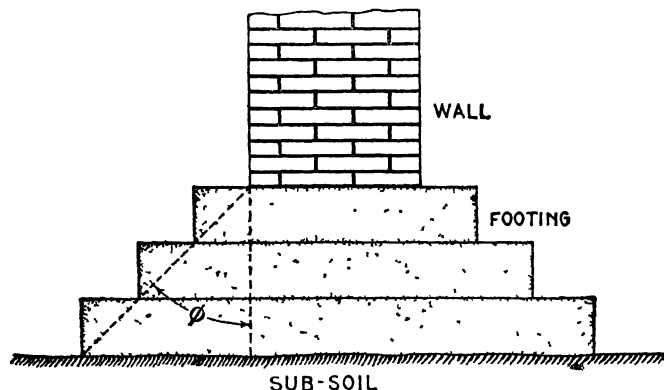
,358.—Angle for foundation footing. *In ordinary practice* the footing courses upon which the walls of the building proper rest, consist of blocks or slabs of stone as large as are available and convenient to handle. Footings of brick or concrete are also used in very soft soils; footing consisting of timber grillage are often employed. A grillage of iron or steel beams has also been used successfully. The inclination of the angle of footing should be about as follows: for metal footings, 75°, for stone, 60°, for concrete, 45°, for brick, 30°. Damp proof courses of slate, or layer of asphalt are laid in or on the foundations or lower walls to prevent moisture arising or penetrating by capillary attraction.
